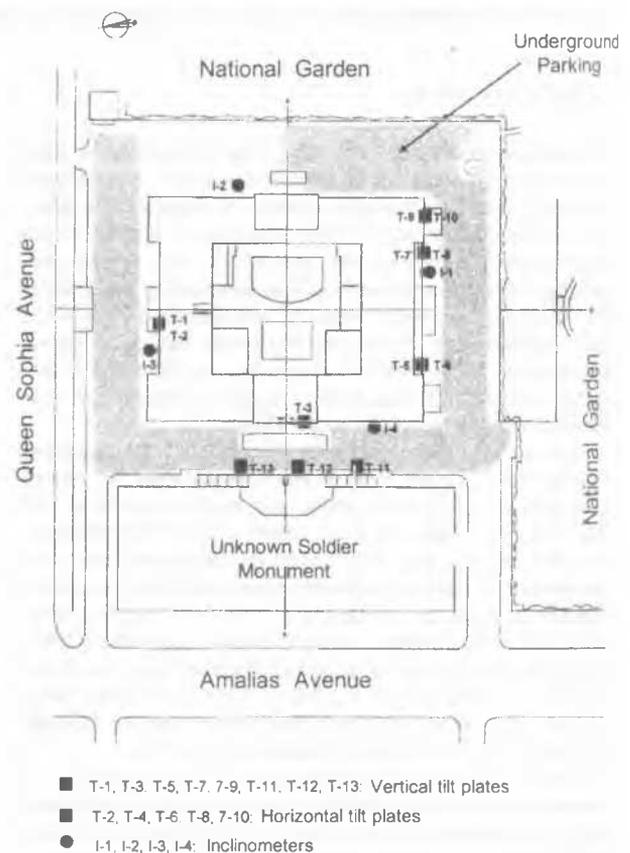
Plan view of the Hellenic Parliament building with the location of the inclinometers and the electronic tiltmeters
